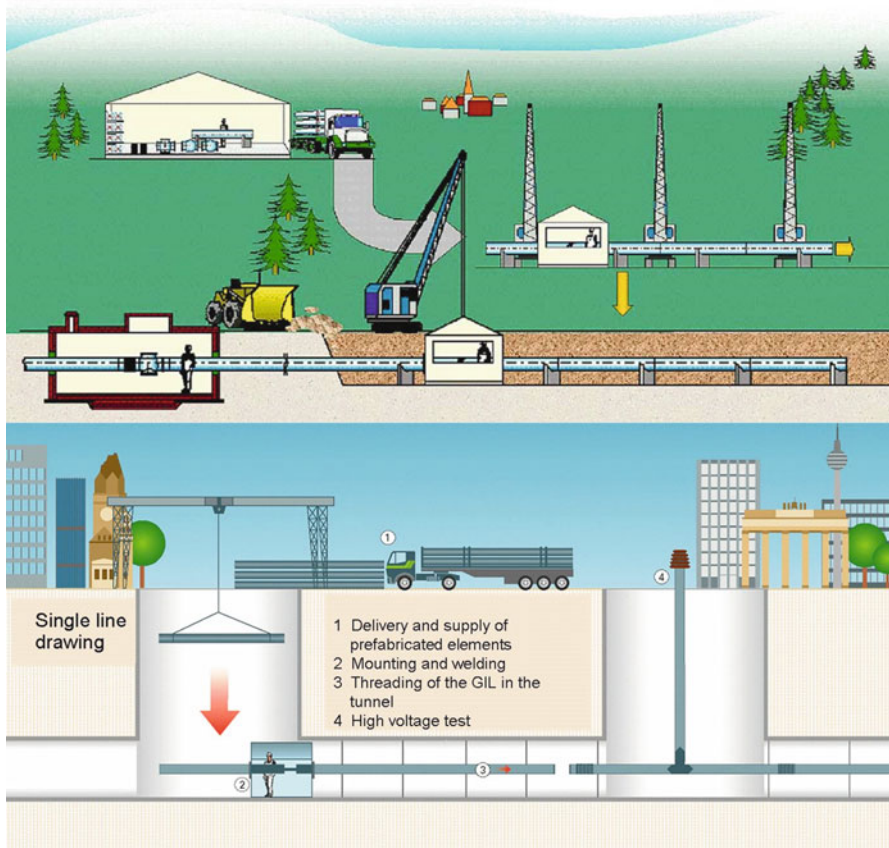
Site logistics scheme for GIL installation in tunnel, above, and below ground
